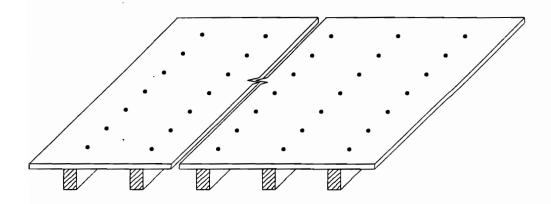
Part of Light-Frame Floor System with Wood Joists and Plywood Sheathing
